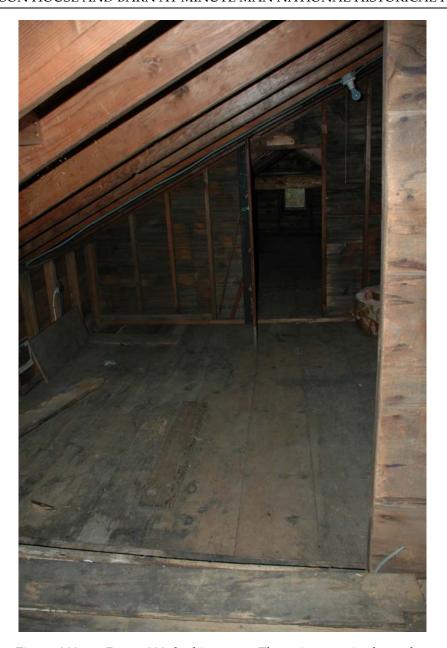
Room 209, looking east. The attic space is above the original 18th century block. The partition wall in the right foreground with horizontal sheathing boards and wrought nails is possibly 18th century, however further investigation is needed to determine this. The frame partition wall in the background was added later and divides the original 18th century attic space.
